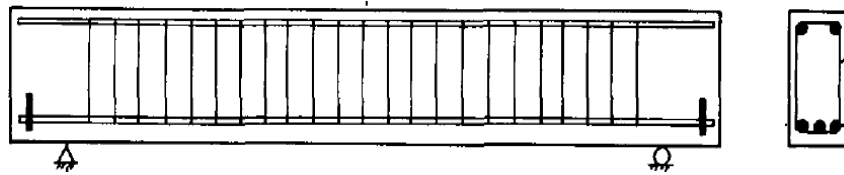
Reinforced concrete beam with longitudinal steel to resist flexure and shear AND added transverse shear reinforcement (stirrups) to resist shear
